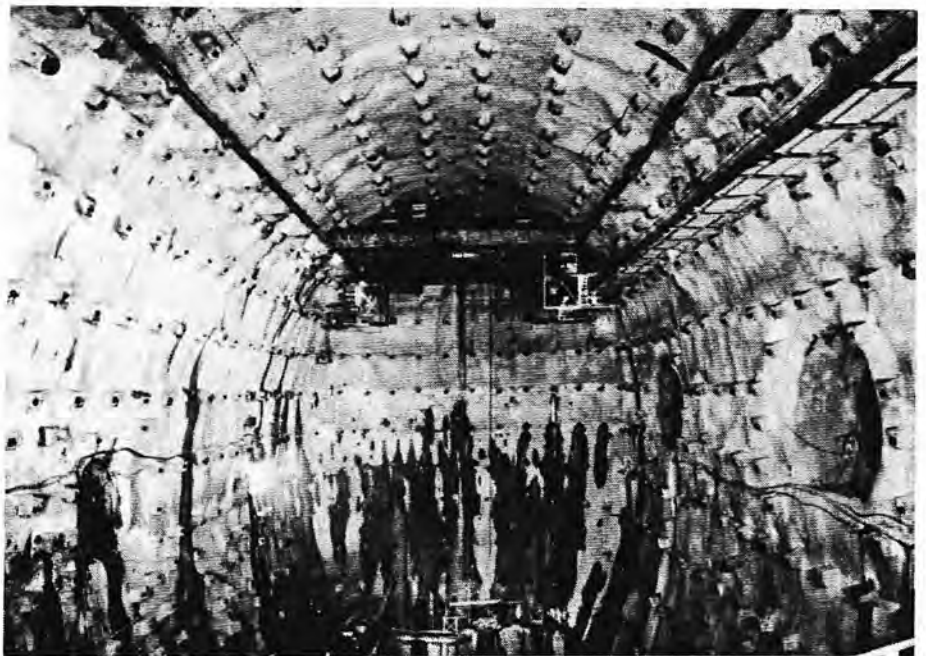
Self supporting cavern 106m long, 54m deep and 33,5m wide using 784 permanent rock anchors installed to lengths of 20 to 28m and prestressed to working loads of 940 to 1300kN, at Waldeck II Pumped Storage Scheme in West Germany.
